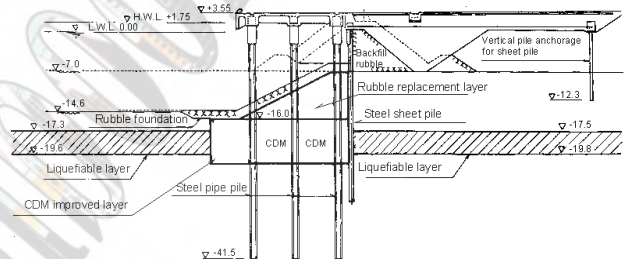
Example of ground improvement for a pile-supported wharf [2]
